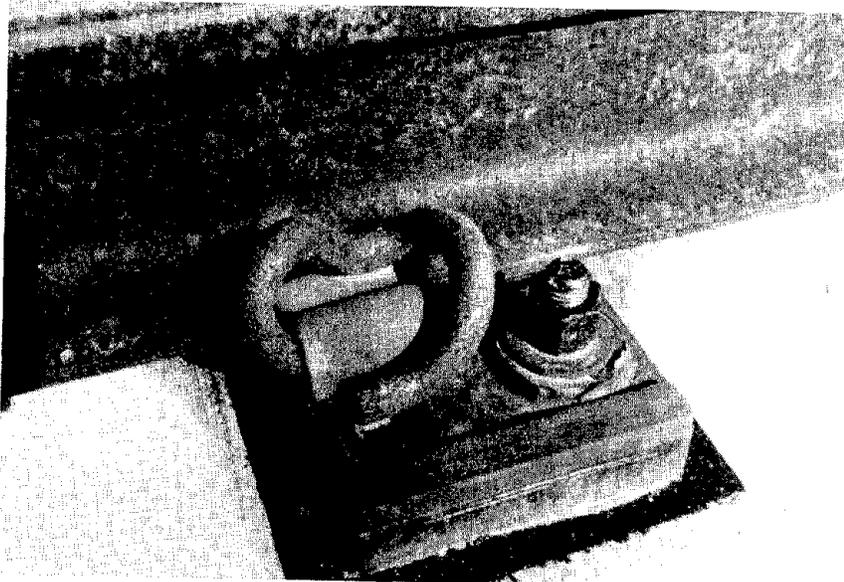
RAIL FASTENED TO BASE PLACE
